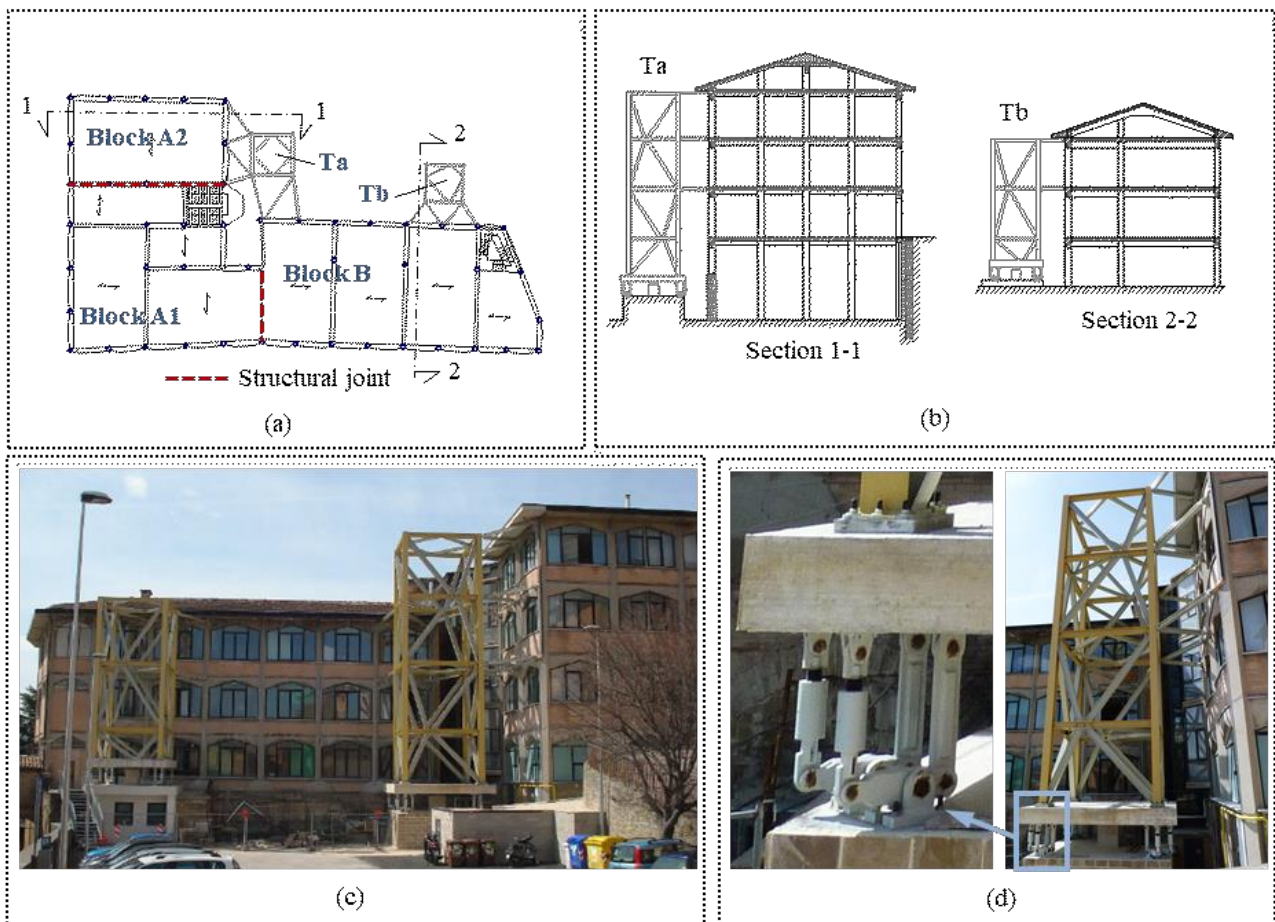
The Costanza da Varano high school: (a) plan view; (b) cross-section; (c) photo of the building; (d) photo of the Dissipative Towers with details of the dampers
